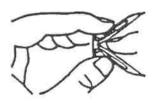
Popping Open Anchor Wing For Thin Walls
